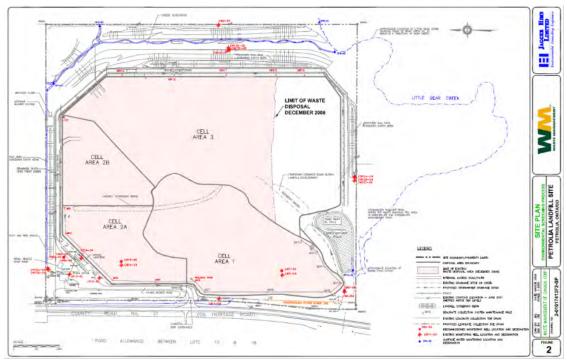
Petrolia Landfill Site Layout (Jagger Hims Ltd. 2009)
